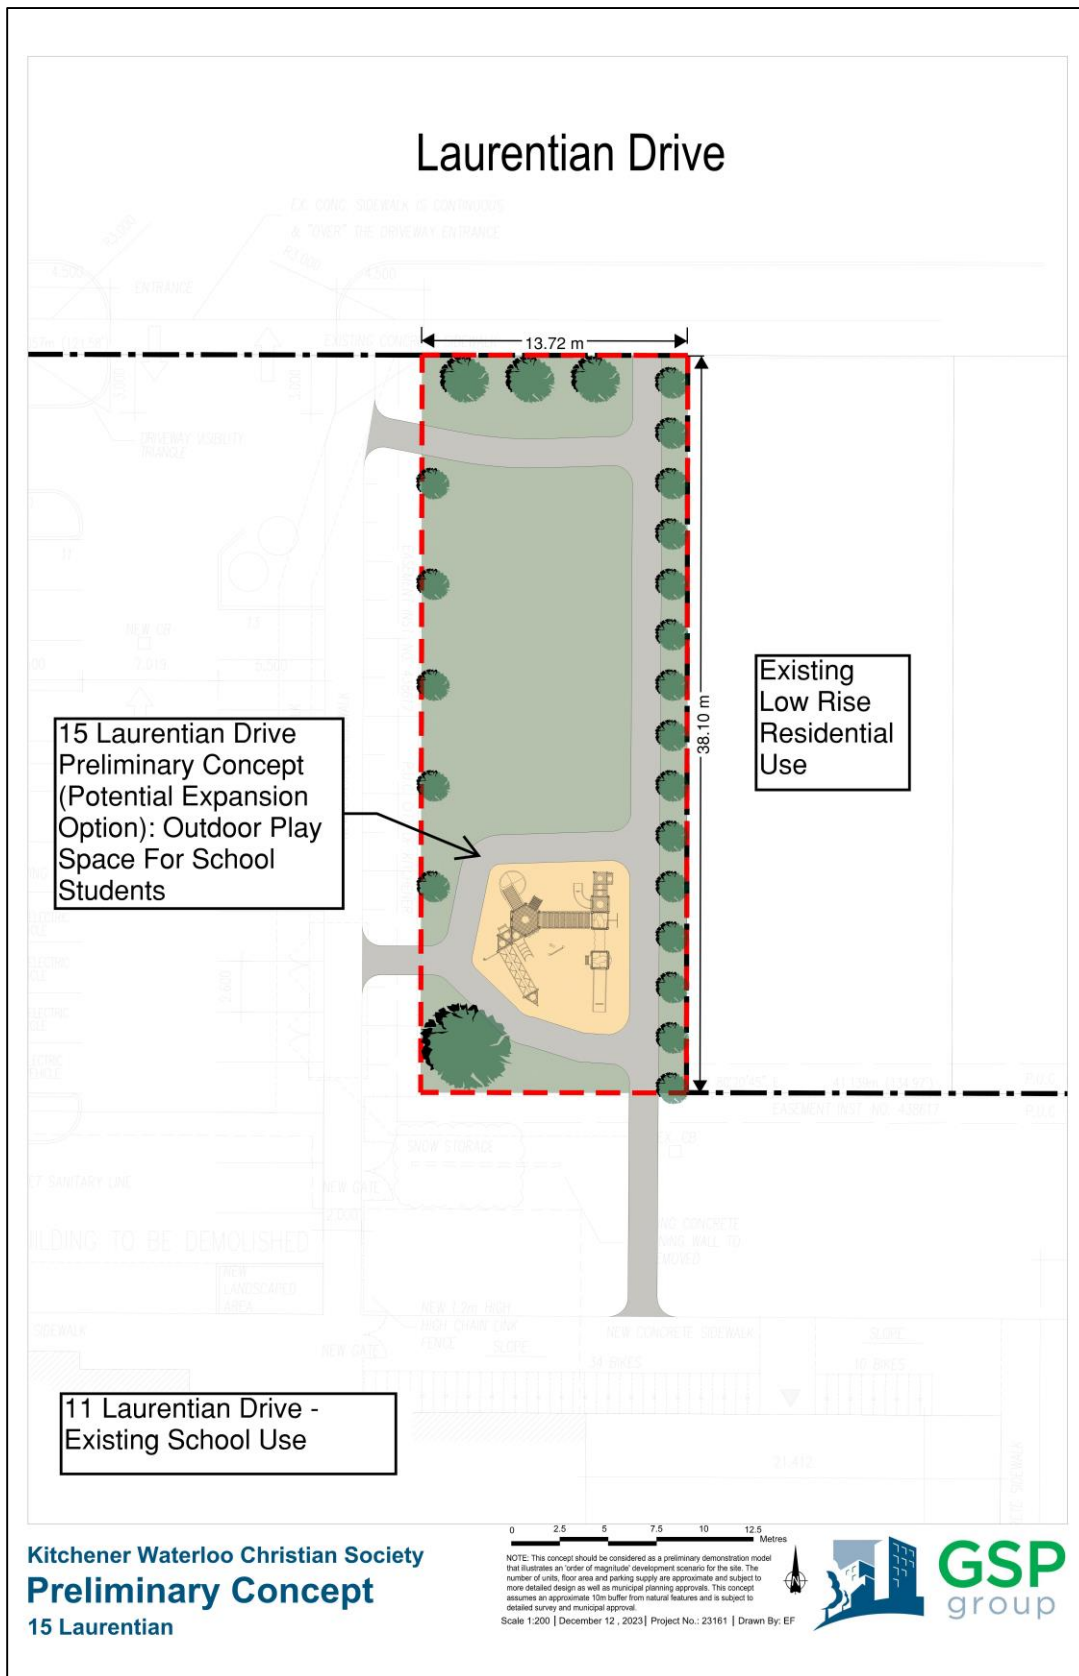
Preliminary Concept (Potential Expansion Option): Outdoor Play Space for School Students
